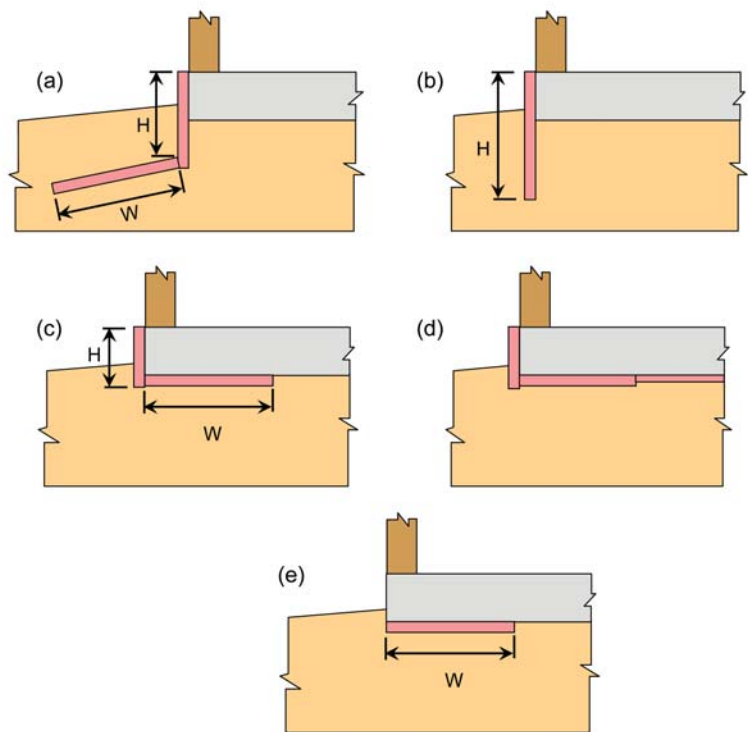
Below-grade insulation options for a concrete slab-on-grade: (a) vertical and horizontal wing insulation, (b) vertical insulation only, (c) insulation on outside and underside of perimeter edge, (d) insulation on the outside edge and entire underside of slab, (e) horizontal insulation only.
